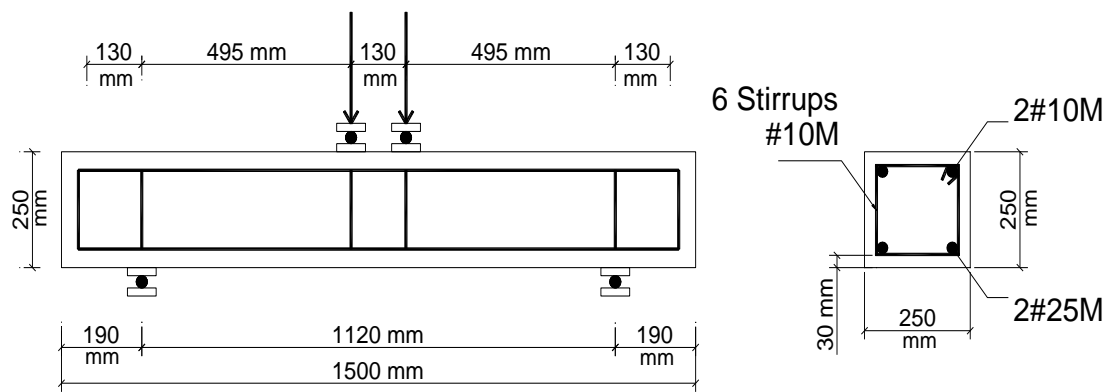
Typical test setup, dimensions, and reinforcement of tested beams in shear
